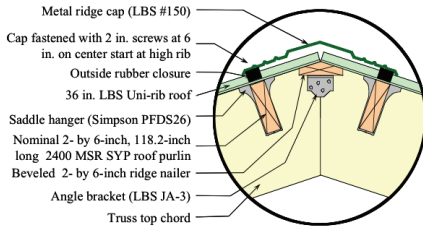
Ridge construction details. Attachment (and detachment) of roof panels from beveled ridge nailers and ridge purlins enabled study of the effects of roof diaphragm continuity. Chord reinforcement hardware (figure 5) is not shown.
